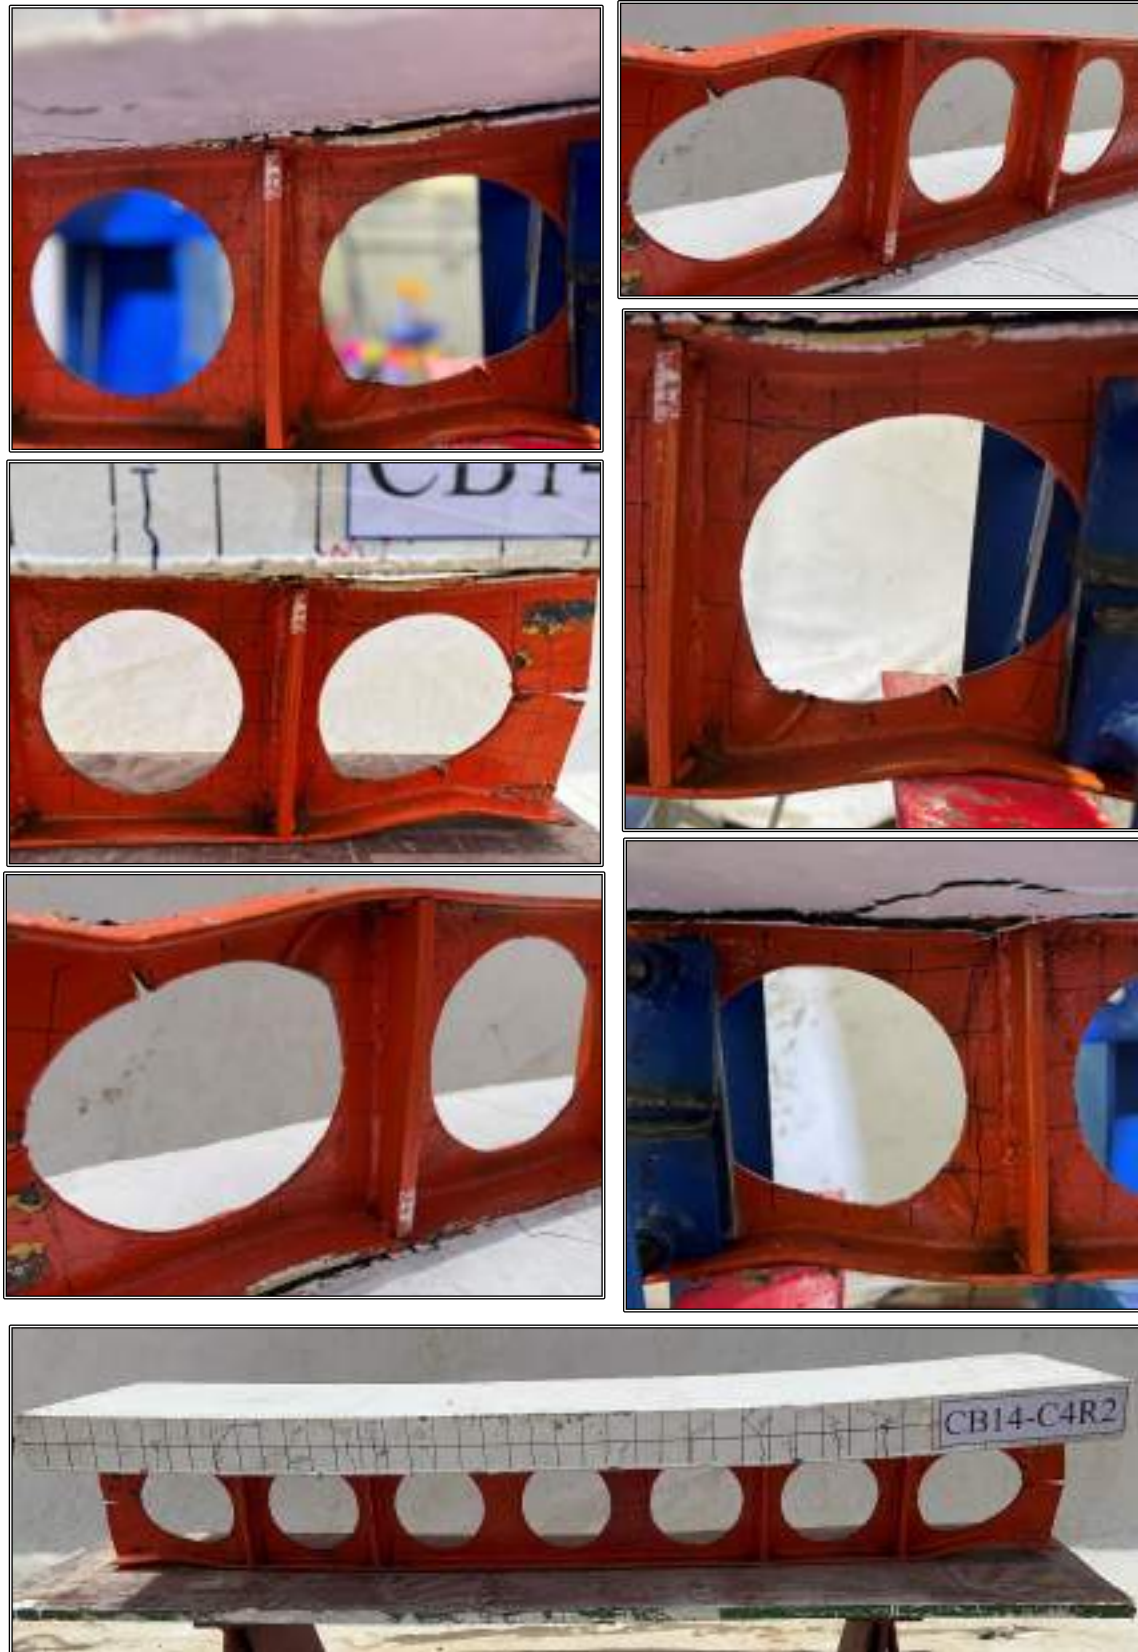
Failure of Beam CB-C4R2 After Testing.
